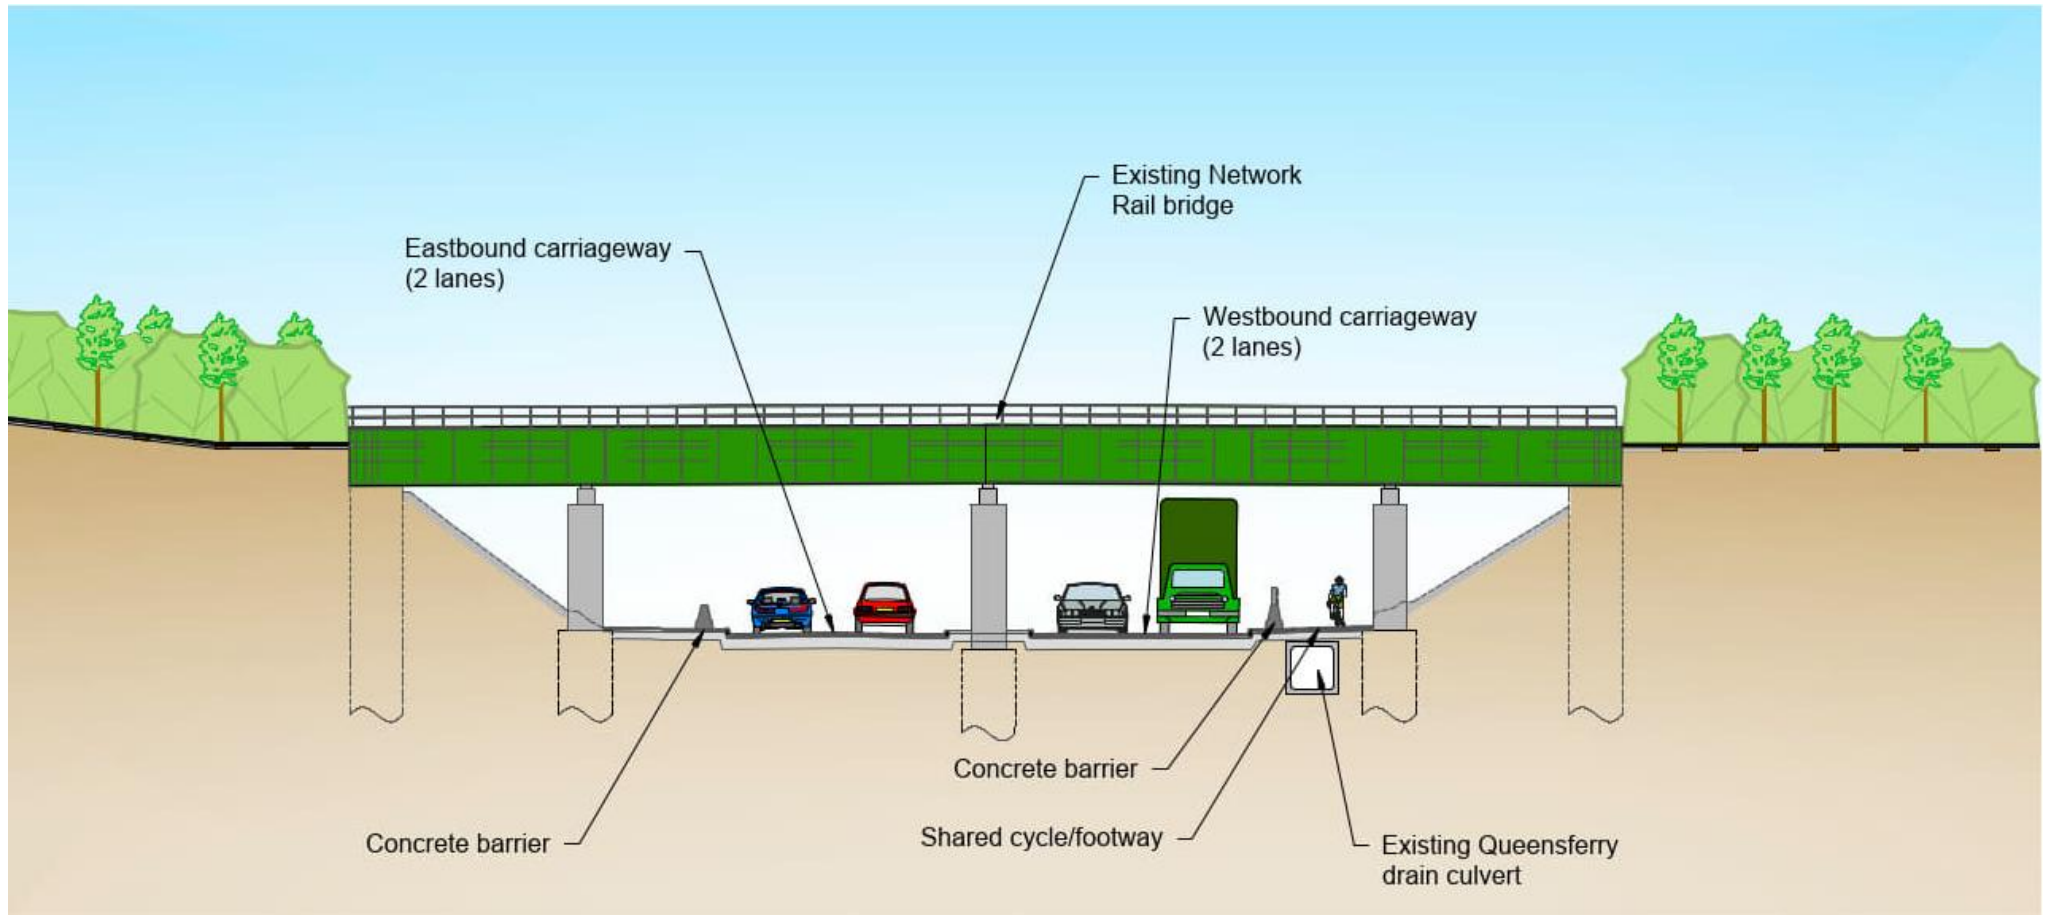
Typical cross section through the existing railway bridge facing north east (Source: Mott MacDonald)
